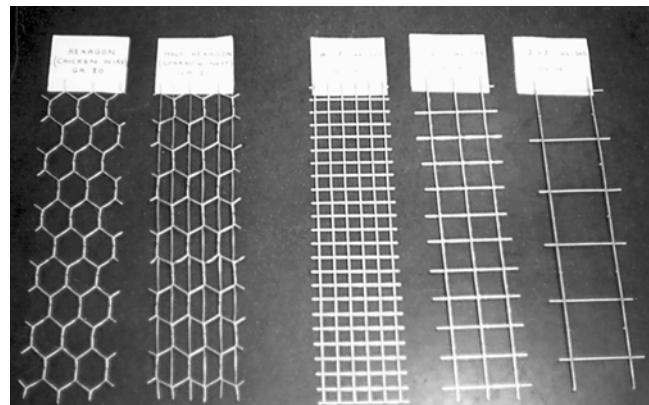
Samples of hexagonal and welded wire mesh.
